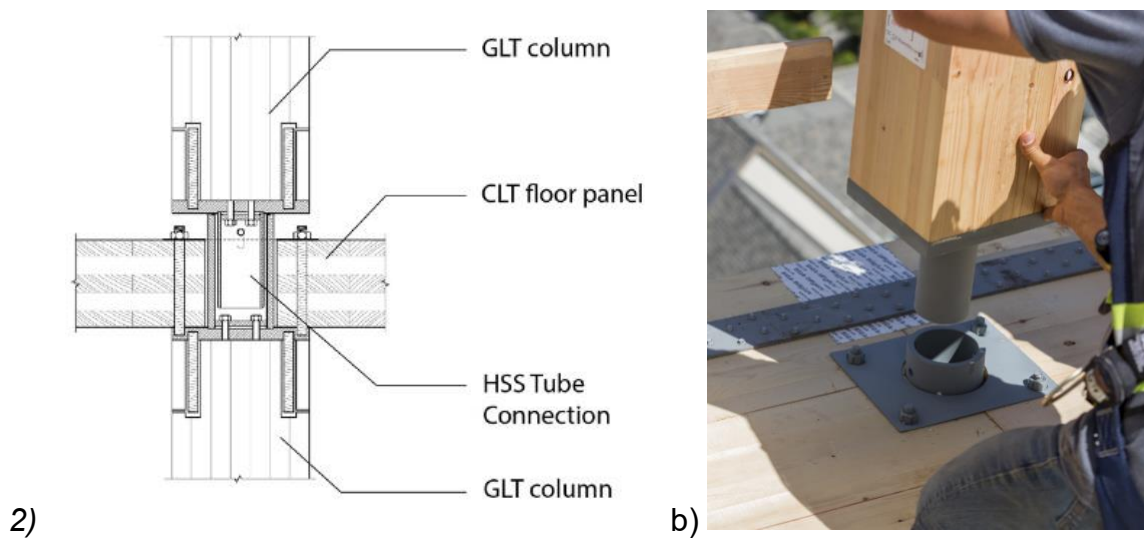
6 Brock Commons' bespoke steel column-to-column in hollow section connection (a) design (Poirier et al., 2022b) and (b) installation (Pilon et al., 2017)
